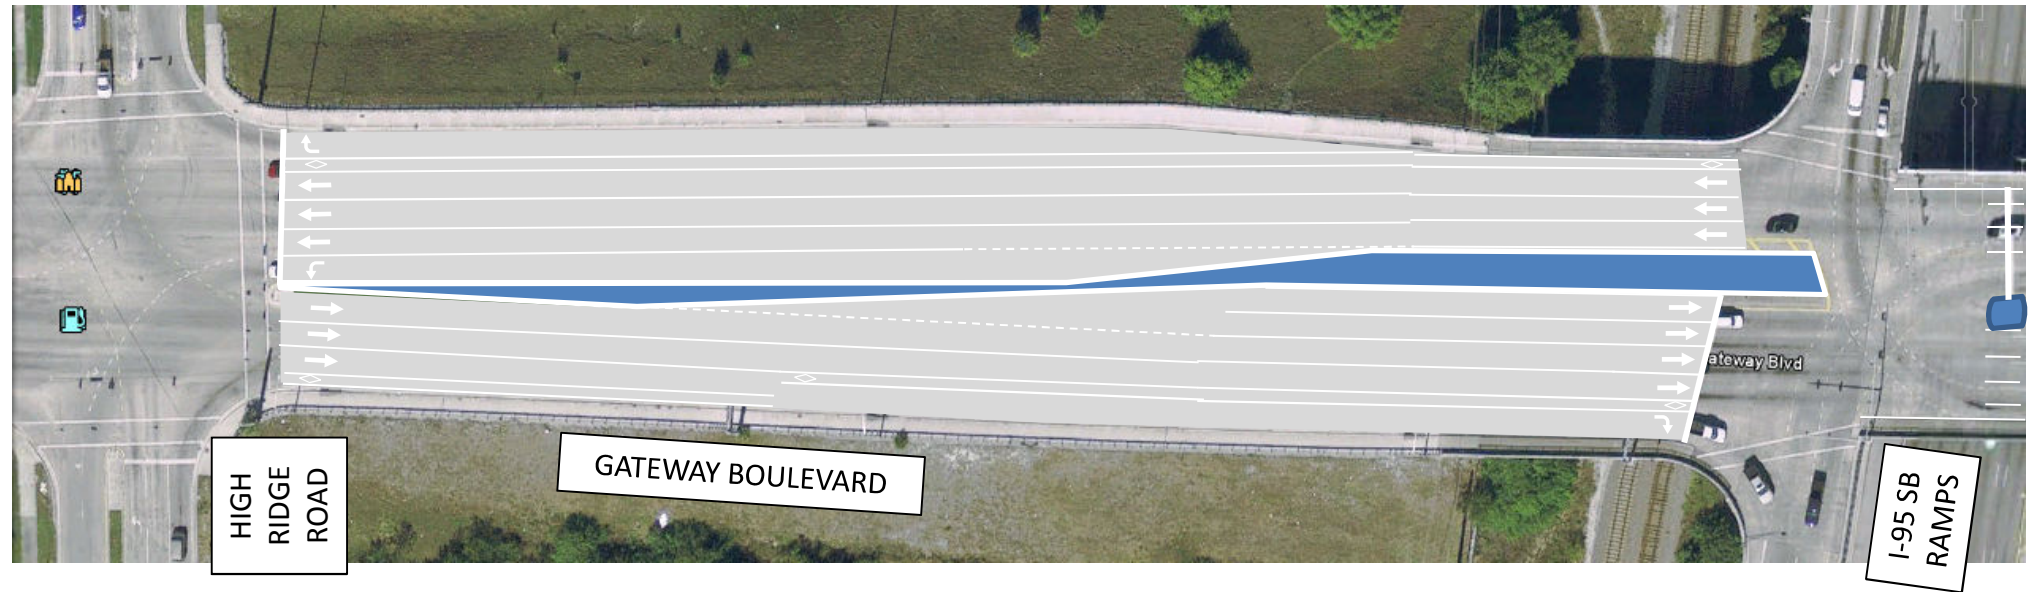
PROPOSED GATEWAY BOULEVARD RECONFIGURATION
